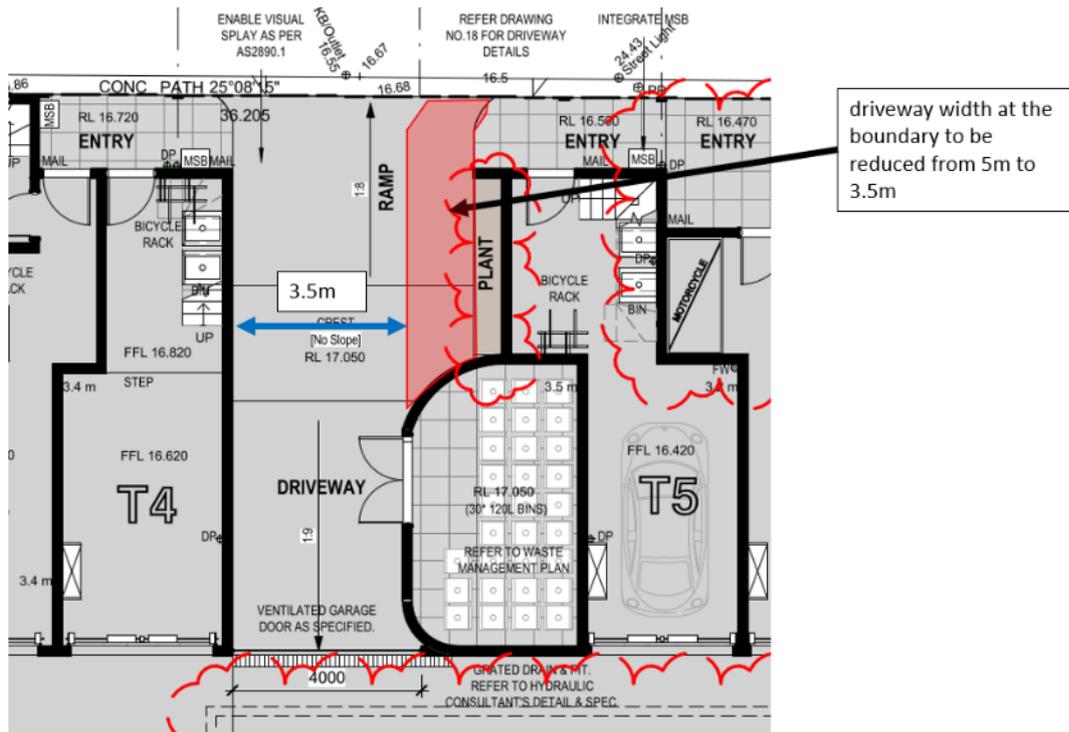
a condition is recommended to reduce the width of the entry driveway at William Lane
